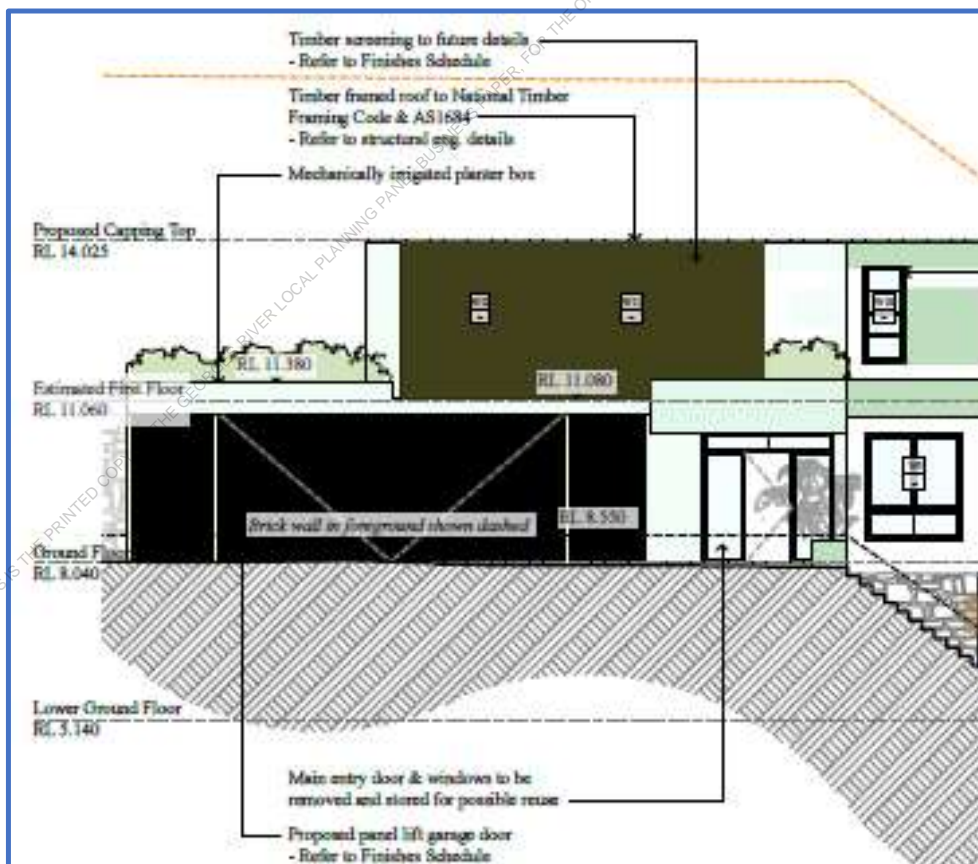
Eastern elevation showing First Floor Planter (Source: Amended Architectural plans)
